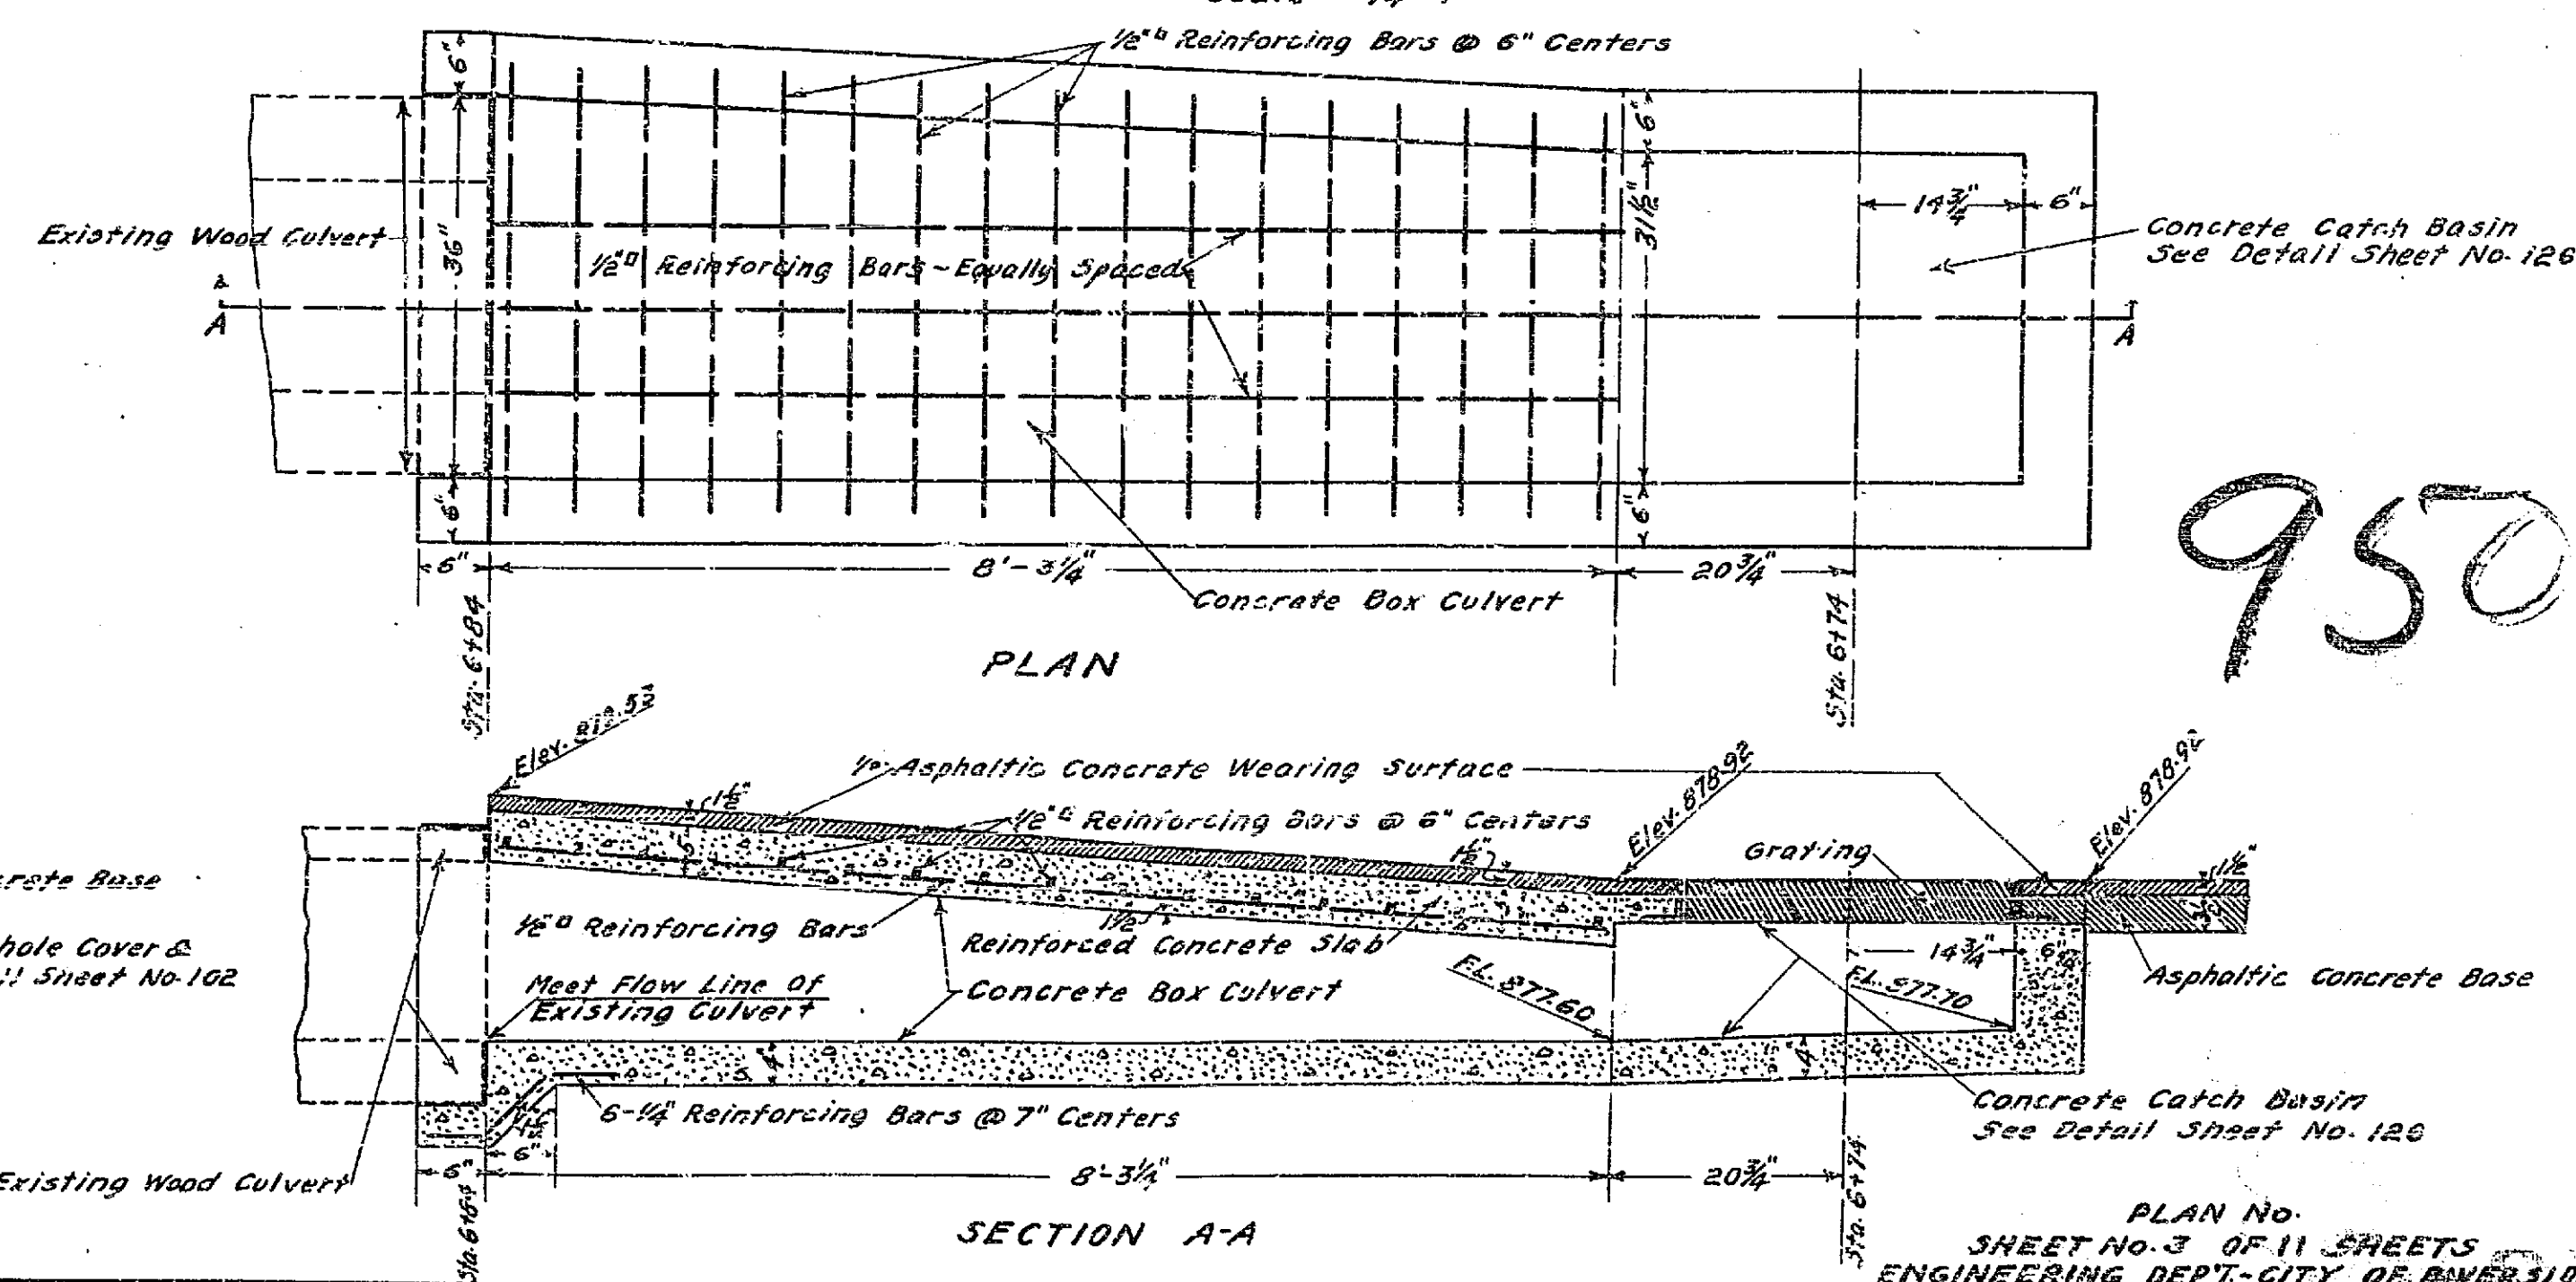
DETAILS OF DRAINAGE STRUCTURE AT STA. 6+74 - NORTH SIDE
